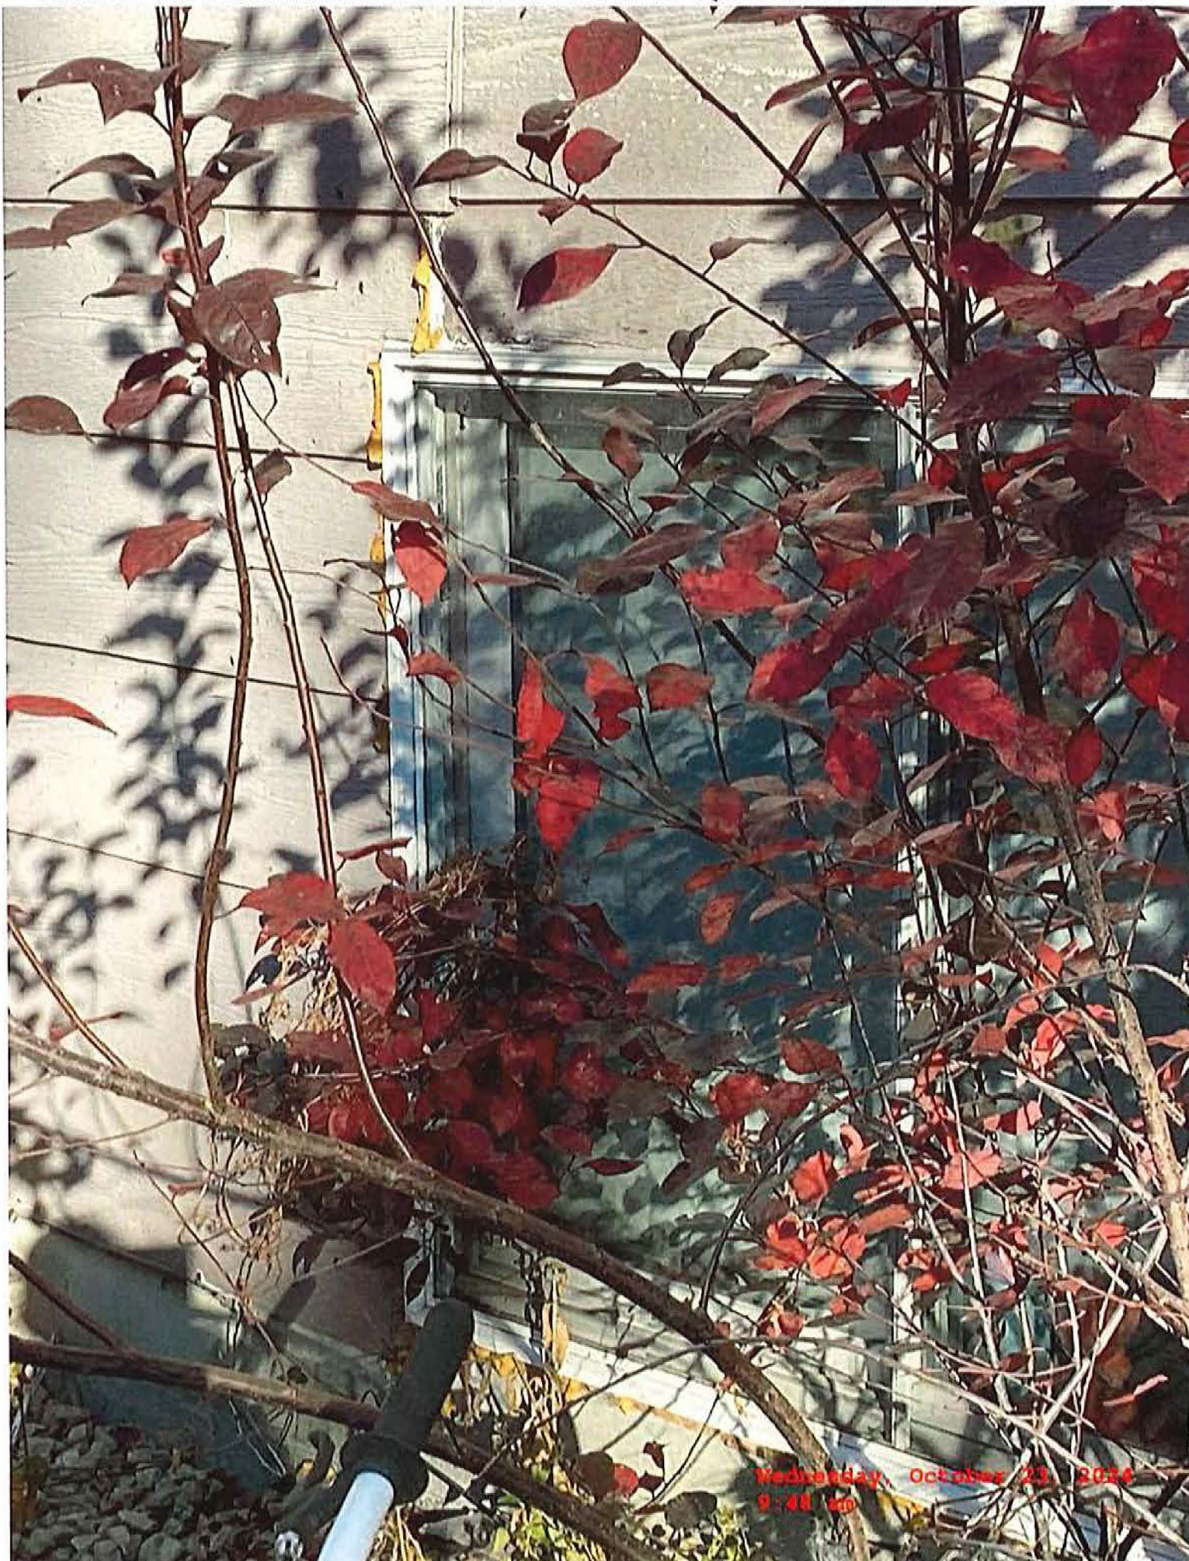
LOOSE & DAMAGED SIDING ON SOUTH SIDE
